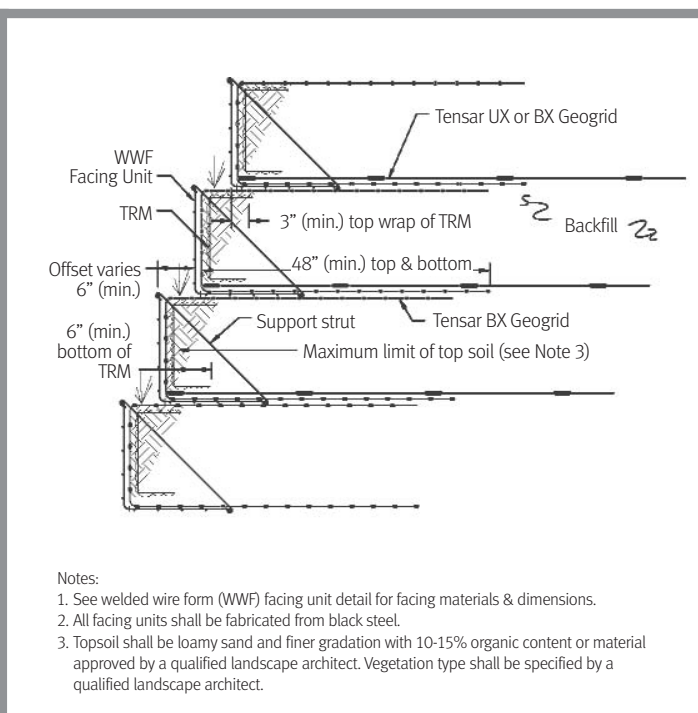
Welded-wire form facing detail (plantable face fill)
